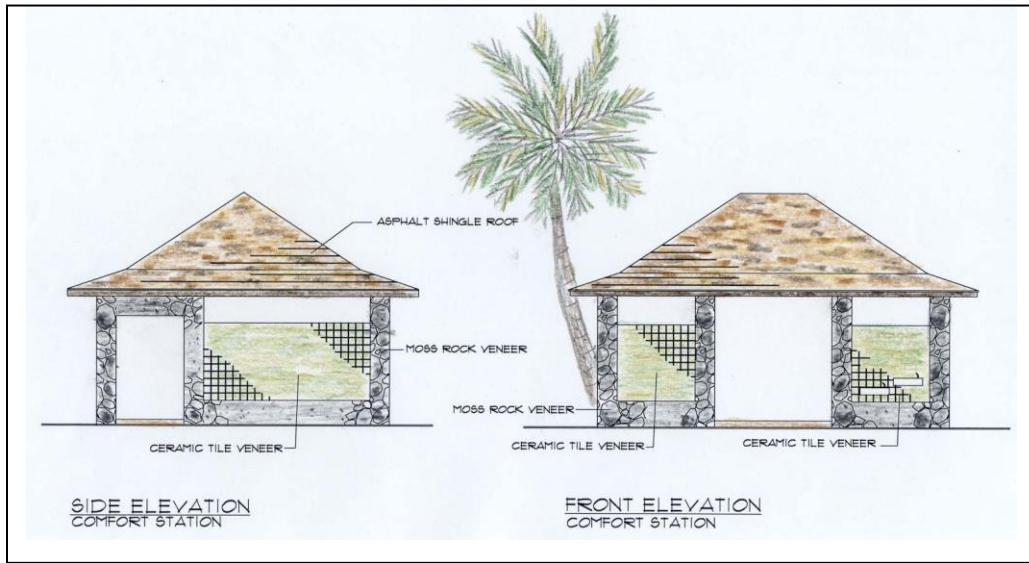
Elevation of the proposed comfort station at Ahukini Landing
